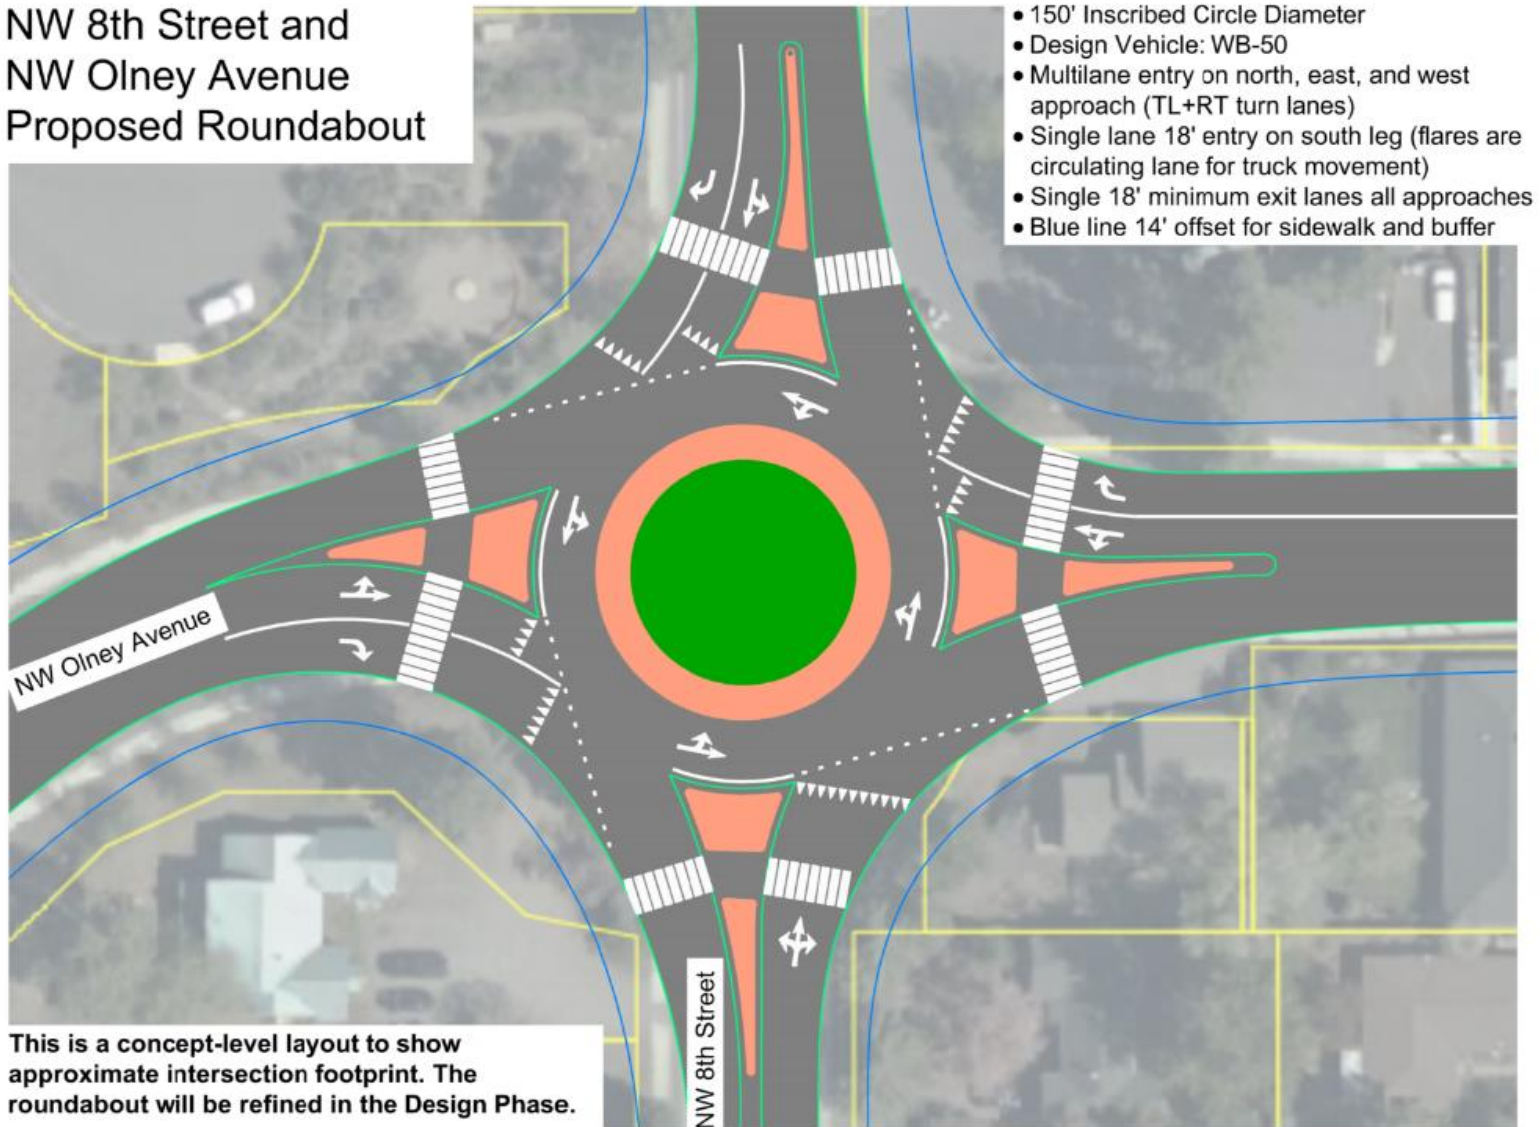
Proposed Roundabout Intersection Layout at NE 8th Street and NE Olney Avenue
